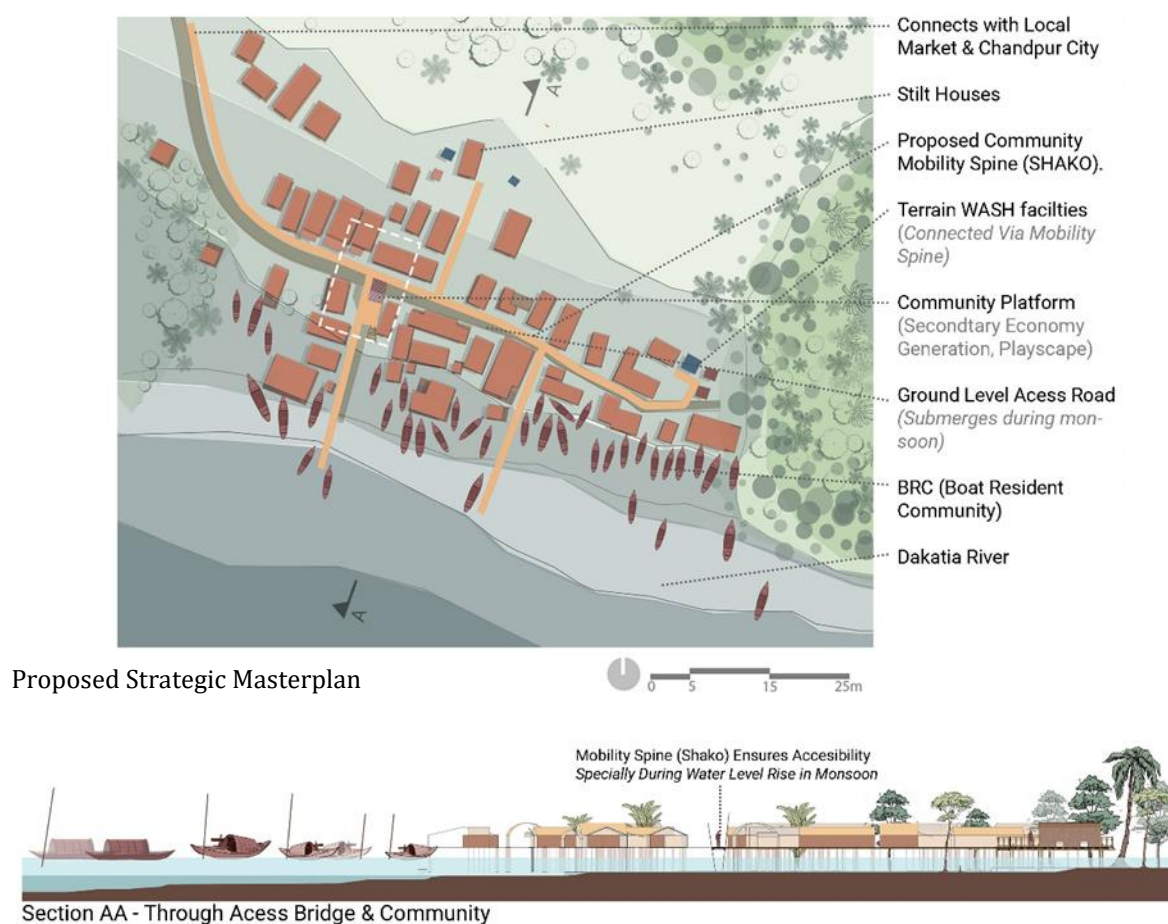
Strategic Intervention at Masterplan & Site Section Level
